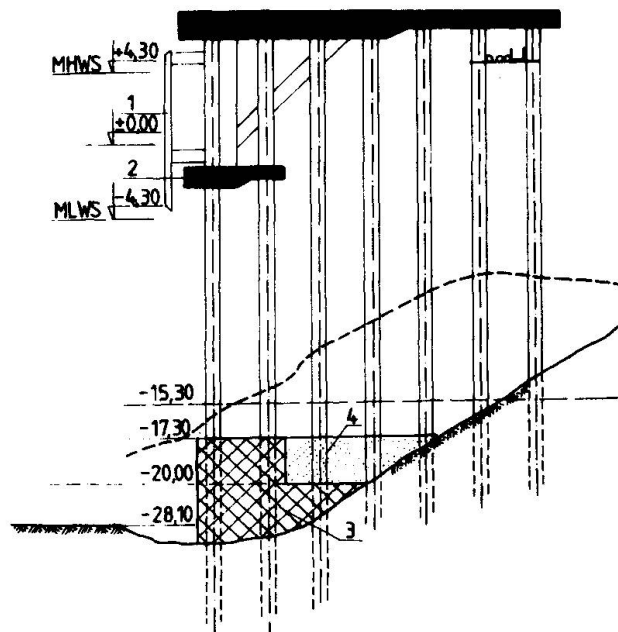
Strengthening of an existing jetty through a submerged retaining wall [5] 1-main fender, 2-concrete fender tray, 3-concrete retaining wall, 4-soil refill
